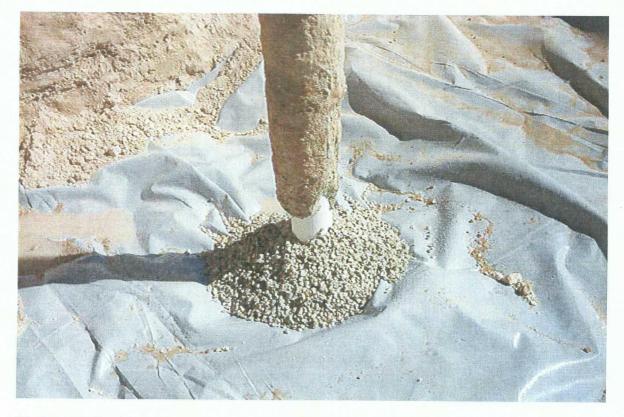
Placement of 20-mil high-density polyurethane impermeable liner at the base of the excavation.
